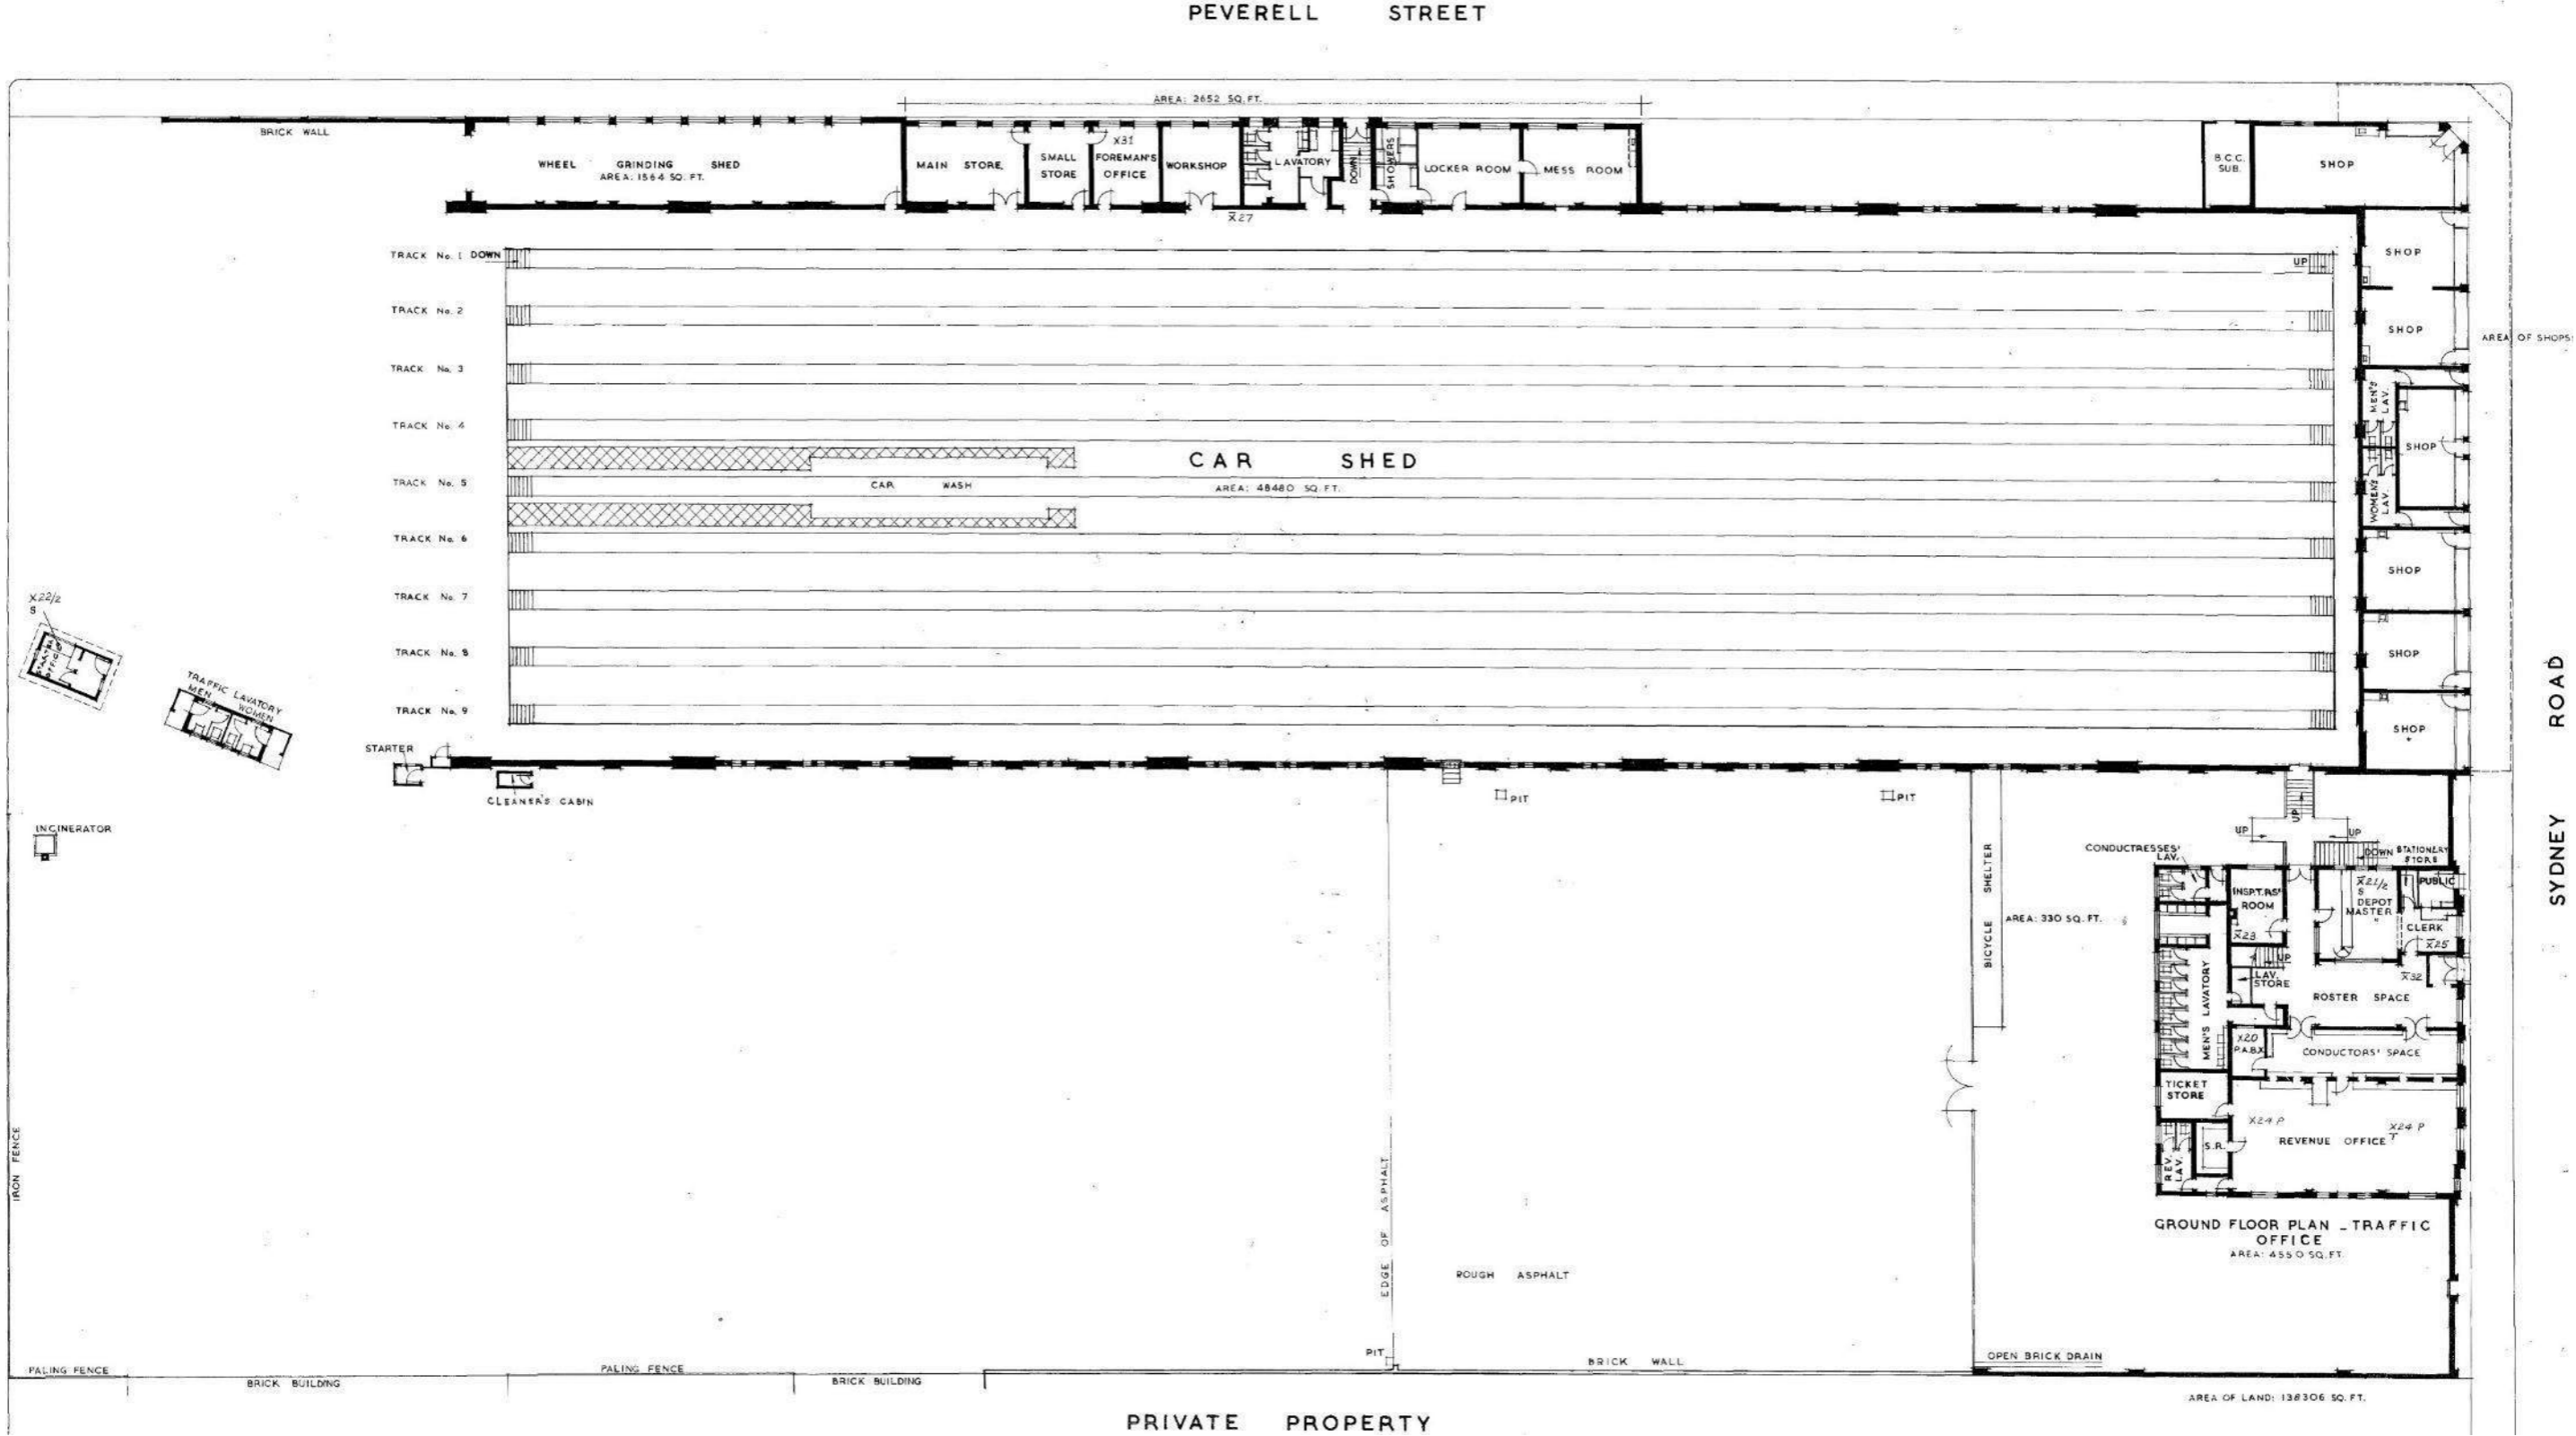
Detail of the MMTB's 1972 plan of the Brunswick depot, showing the Traffic and Revenue office building (with floorplans), the shopfronts (floorplans showing seven shops, plus toilets and adjoining substation on Peveril Street), car shed (with nine tram roads and a tram wash), workshops (floorplans showing nine rooms plus entry stairway), starter's office, and toilet block. The plan also shows the location of an incinerator, cleaner's cabin, pits, bicycle shelter, brick walls, open drains, and an area of 'rough asphalt' behind the Traffic and Revenue office (which coincides with the footprint of the old tram shed)
